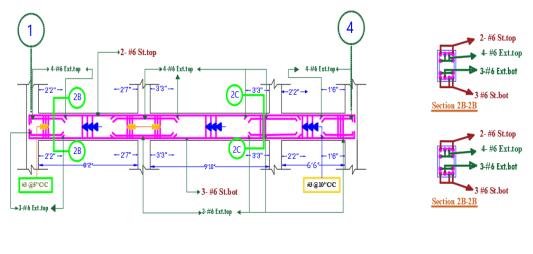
Reinforcement Area of 2ndFLOOR (Y-Axis)
